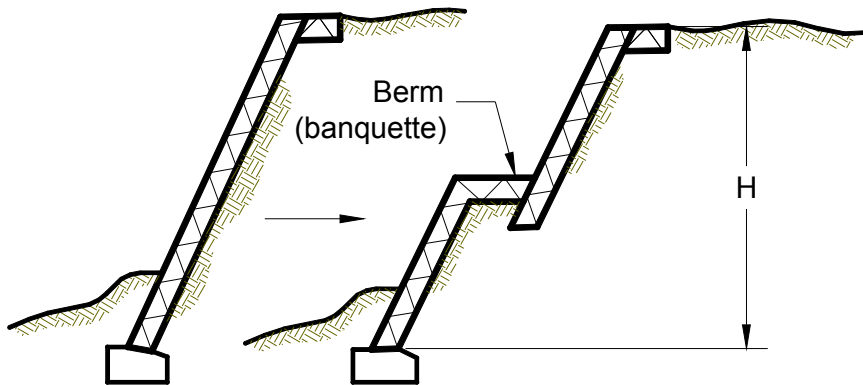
a Revetment with -2.0 : 1 slope
